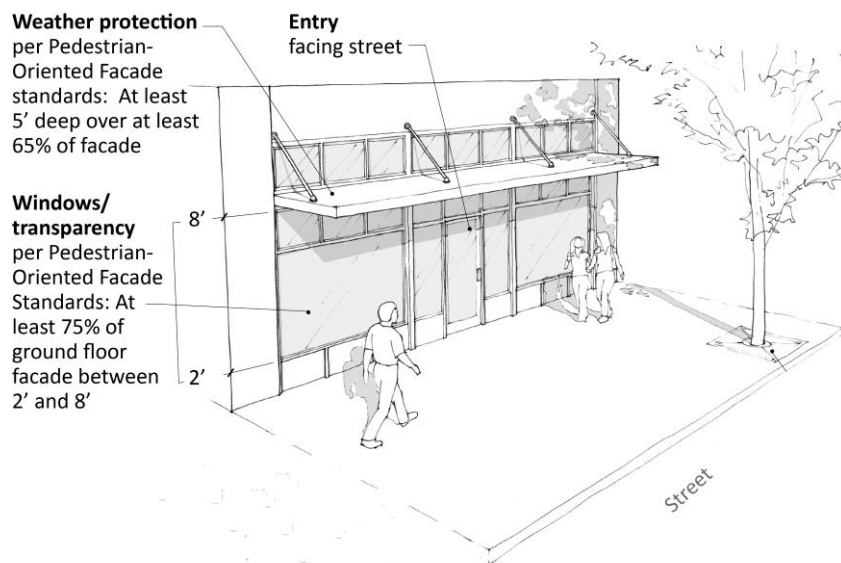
B.1. An example of a pedestrian oriented façade.
